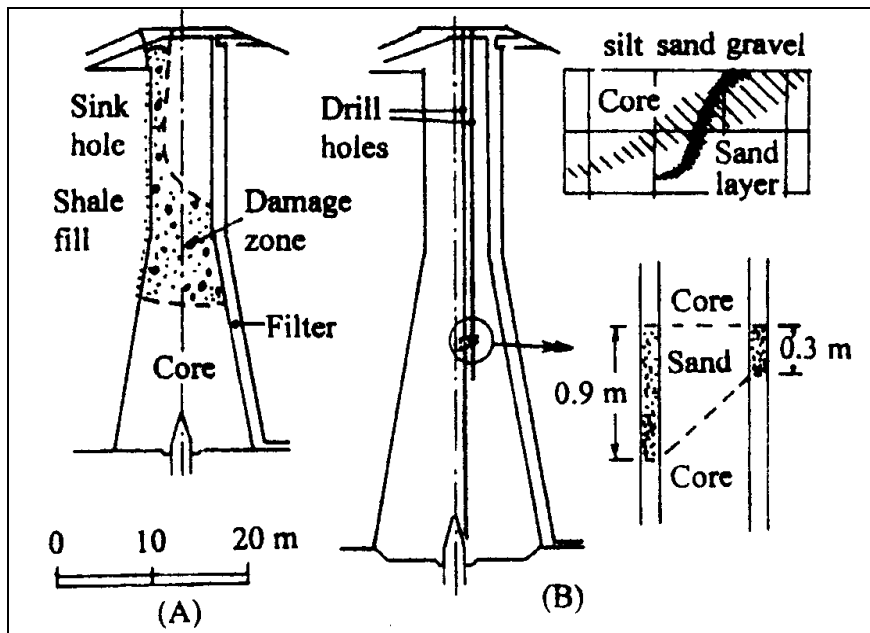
Balderhead dam, showing A - Damage zone where sink hole formed and B – Erosion hole filled with water washed sand
